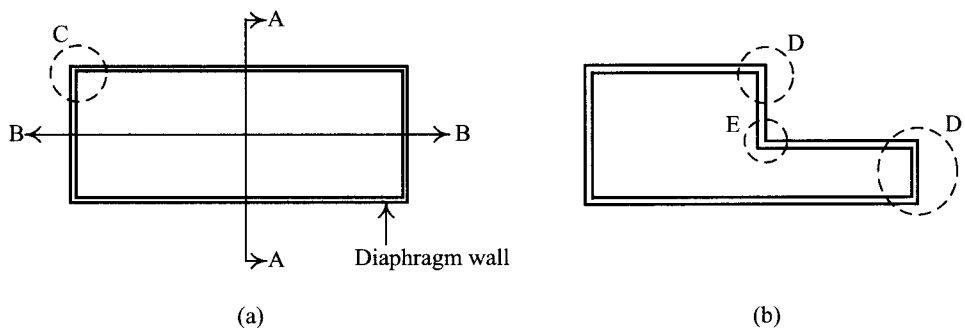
Zones of plane strain behavior and three-dimensional behavior in excavations (a) rectangular excavation and (b) irregular excavation.
